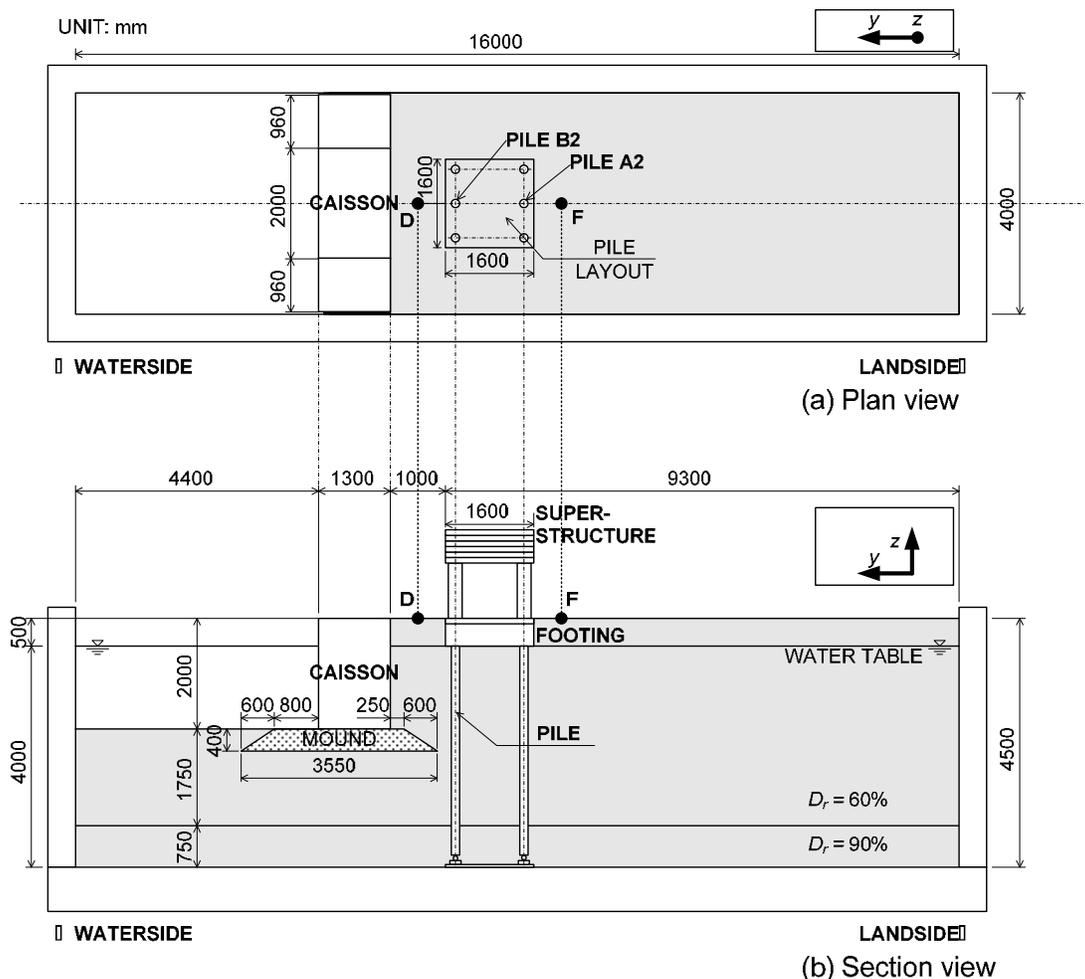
Illustrations of the specimen and the locations of the measurement points D and F : (a) Plan and (b) section views.
